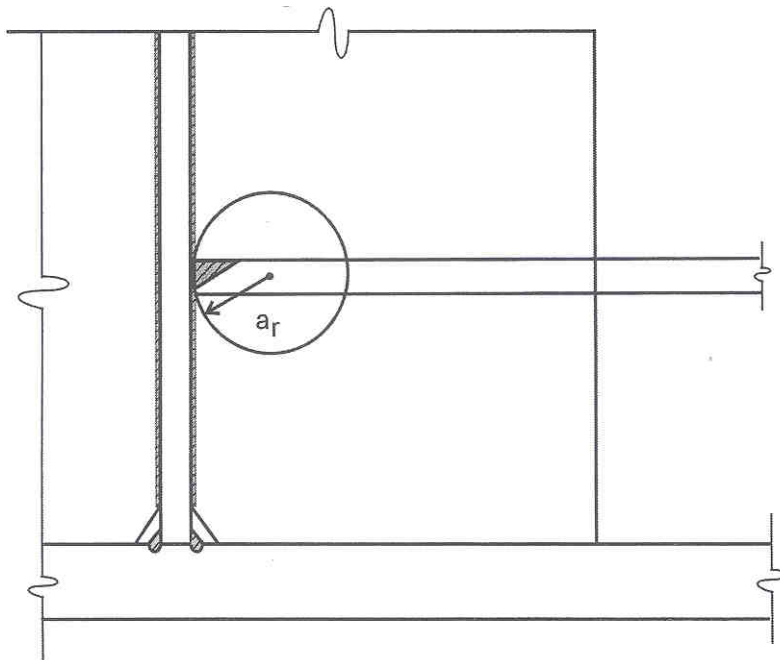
Idealized Circular 3D Crack Model at Lateral Gusset Plate-Vertical Stiffener Intersection. [1].
